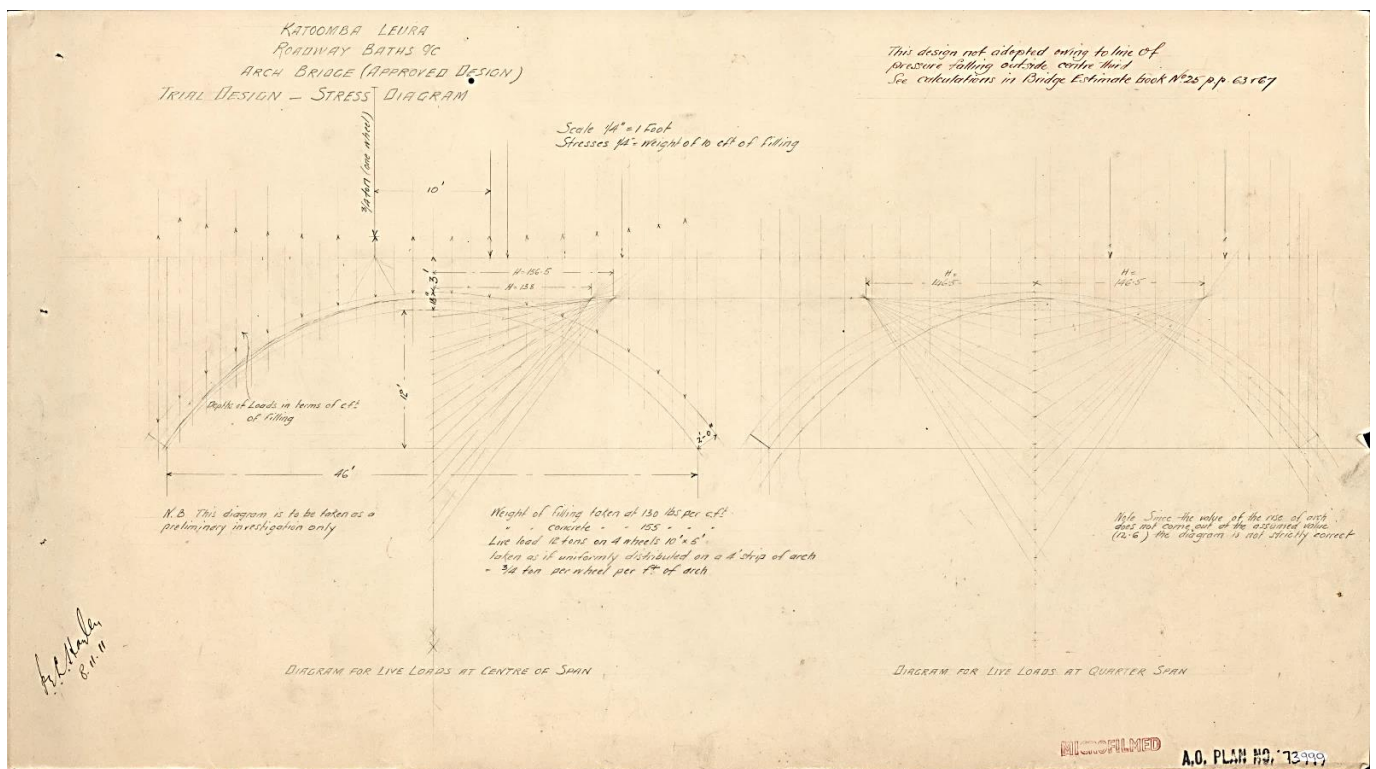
Trial Design of approved Bridge Design, Stress Diagram, Public Works Department 1912. (AO Plan No 73999).
